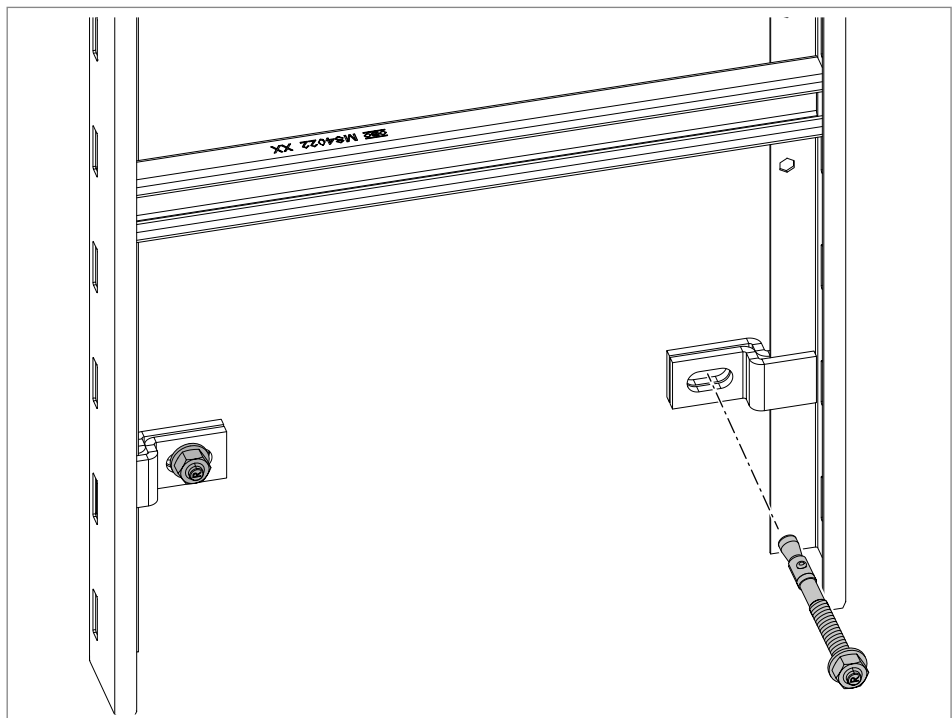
Fasten wall bracket WB with vertical ladder to the wall
